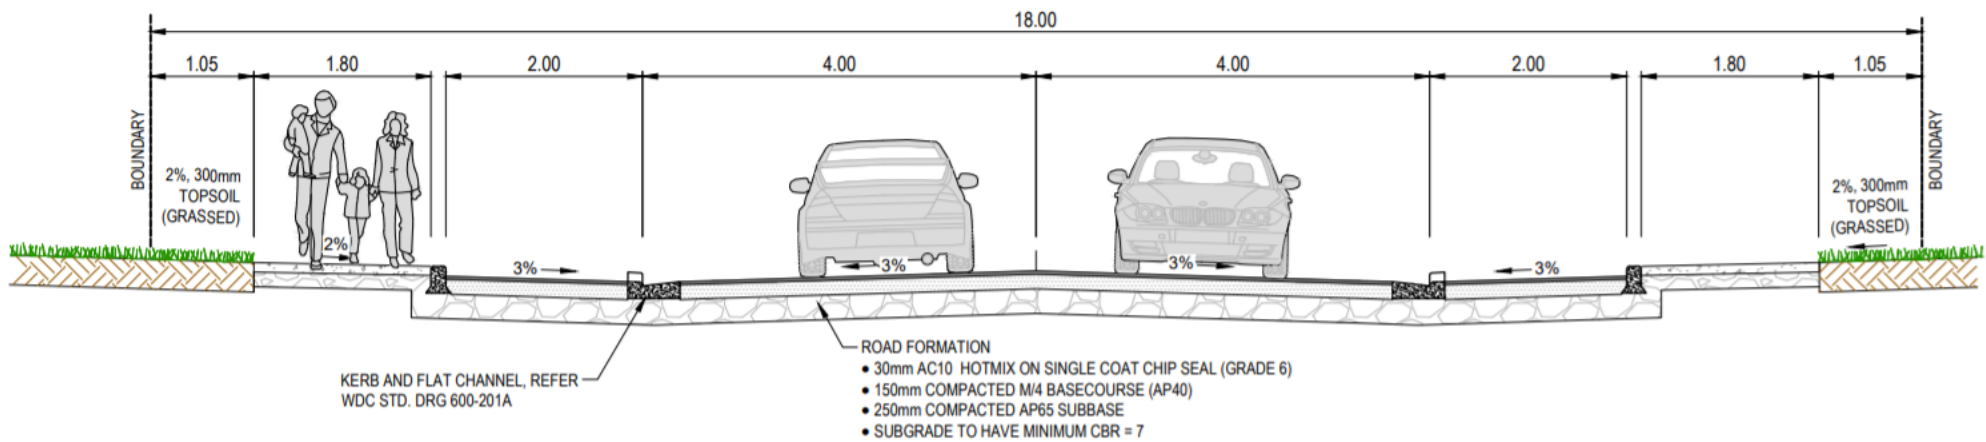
Typical Cross Section for Roads 3, 5 and 9
